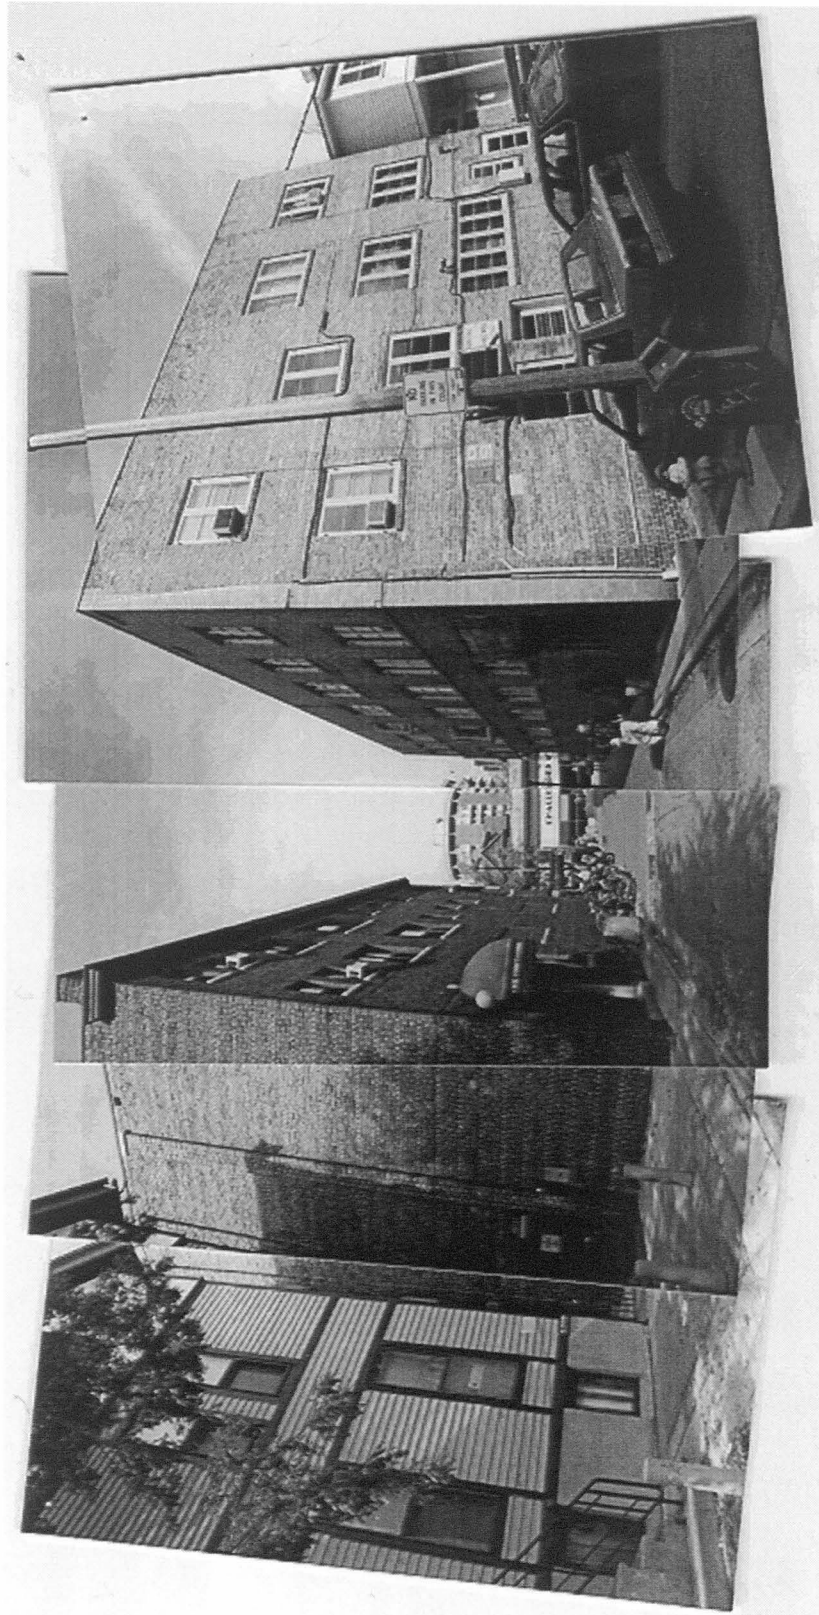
Panoramic Reconstruction of Site (with Distortions) Taken from the Parking Garage Looking Toward State Street
